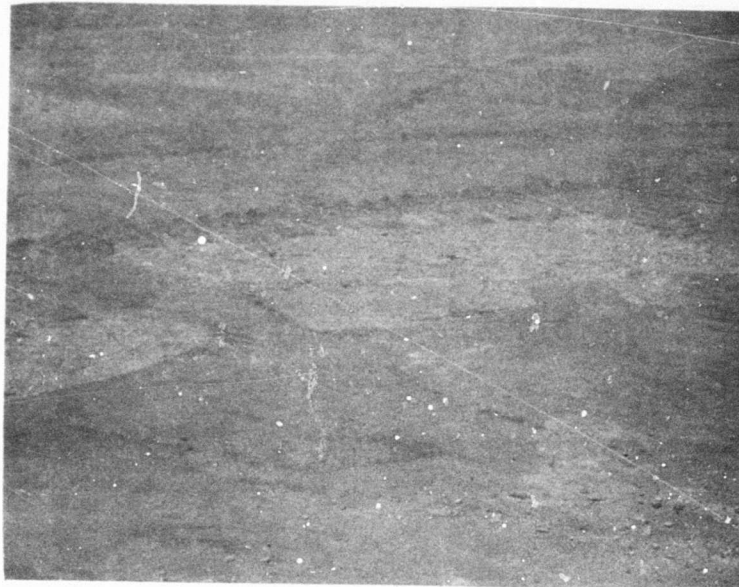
Test 1-1, Pavement Gouges Made by AC 645 Loaders with Four in One Buckets
